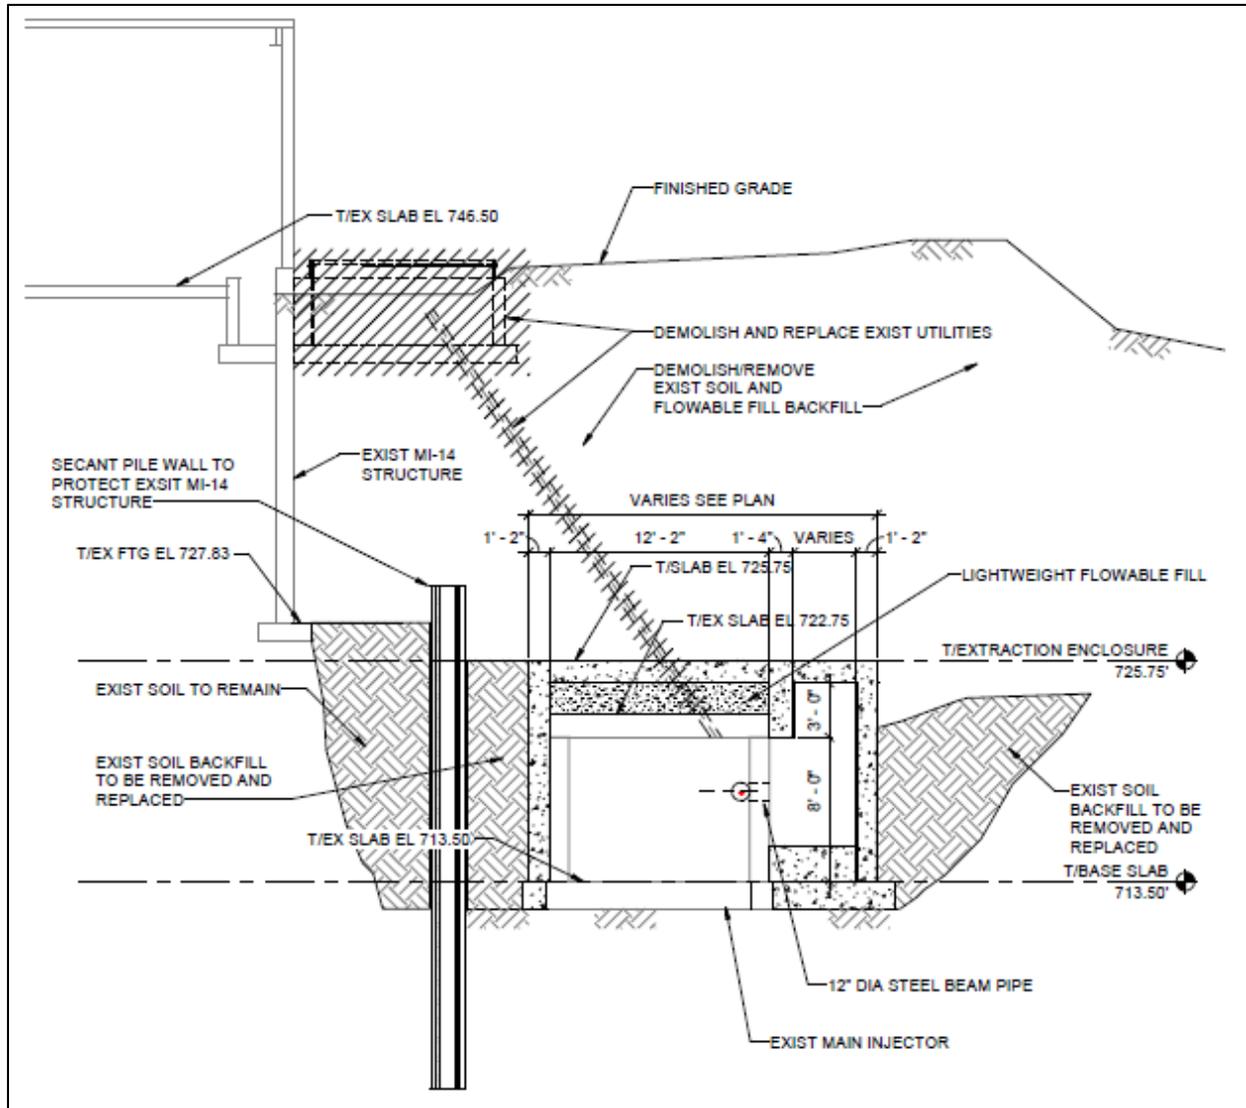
Beamline Extraction Enclosure Section View at MI-14 Showing the Structural Concrete Cocoon Around the MI Enclosure
